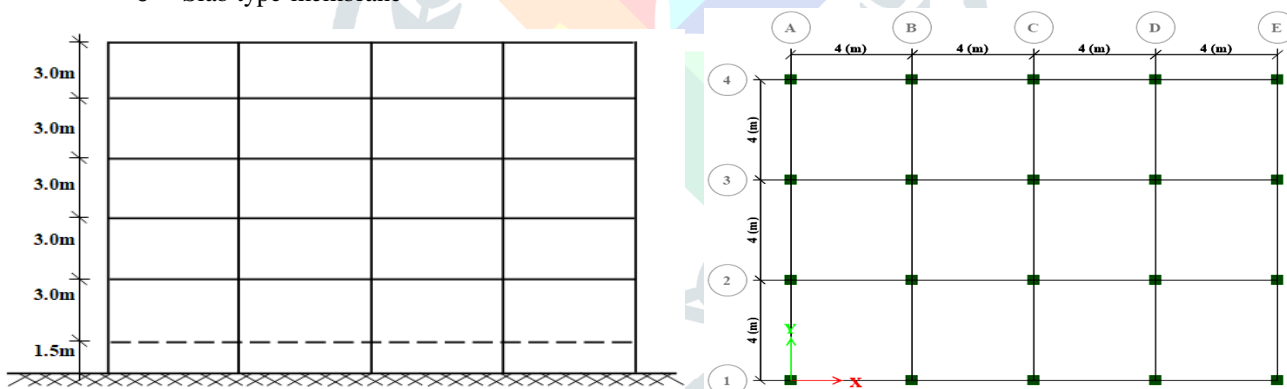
Five-storey Benchmark Building: Plan & Elevation (All dimensions are in m)
